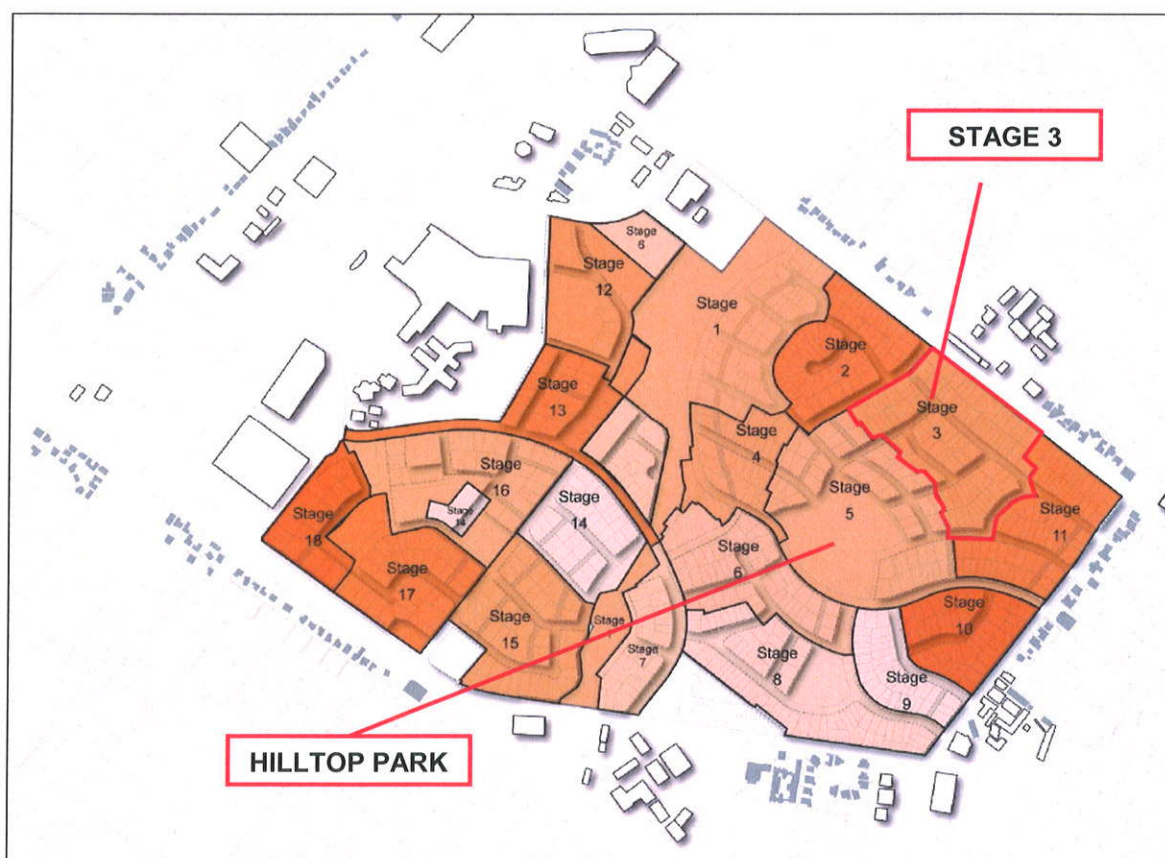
Approved Staging plan (Source: Bonnyrigg Masterplan)
